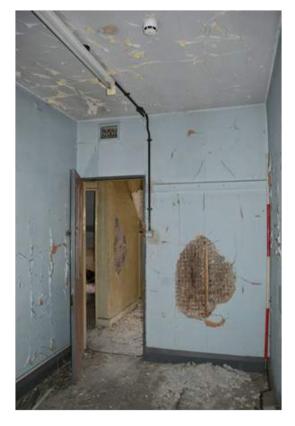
View within room S12, note the mesh construction behind the plaster. Scale 2m.
